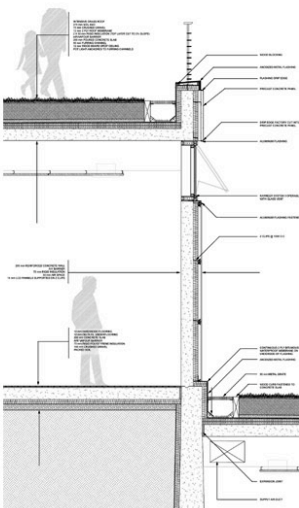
DETAIL WALL SECTION SHOWING PANELS AND RELATIONSHIP BETWEEN INTERIOR AND EXTERIOR
